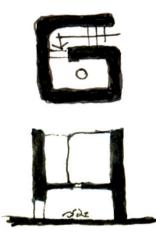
Above: plan for the elevated hūr room. Below: cross section in the traditional hūr unit.
